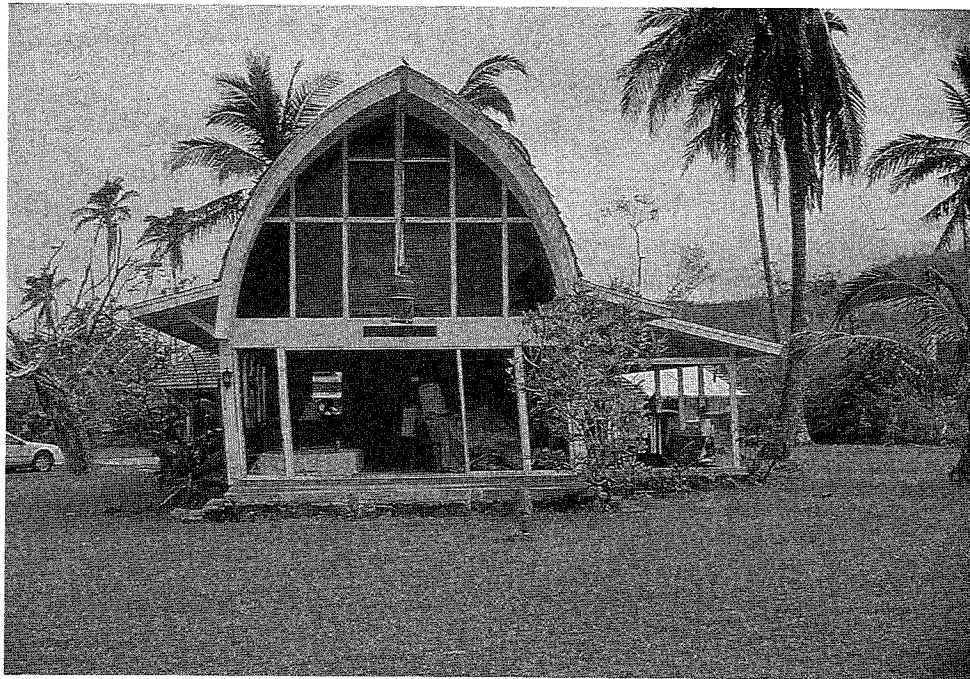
Wind-damaged home with a Level 2 damage rating for overall building condition. This custom home was built in 1965 using site-built, nail-laminated arches (not be confused with modern glue-laminated arches). The roof (and wall) was made of wood decking fastened to the arches and wood shingle roofing. As shown, this home suffered severe racking as a result of delamination of the arches and insufficient lateral bracing. The racking appears to have broken some of the glazing. The slab-on-grade foundation was unharmed. ("X "means the wall rating was combined with roof for this home.)
